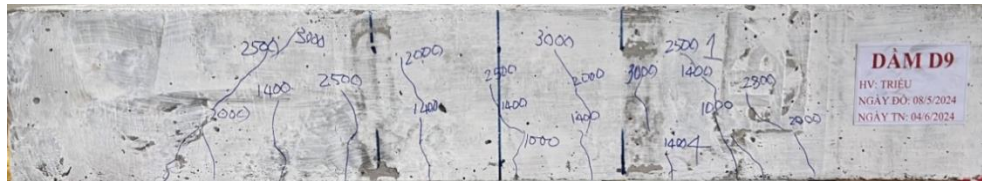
Cracks of D9 reinforced concrete beams
